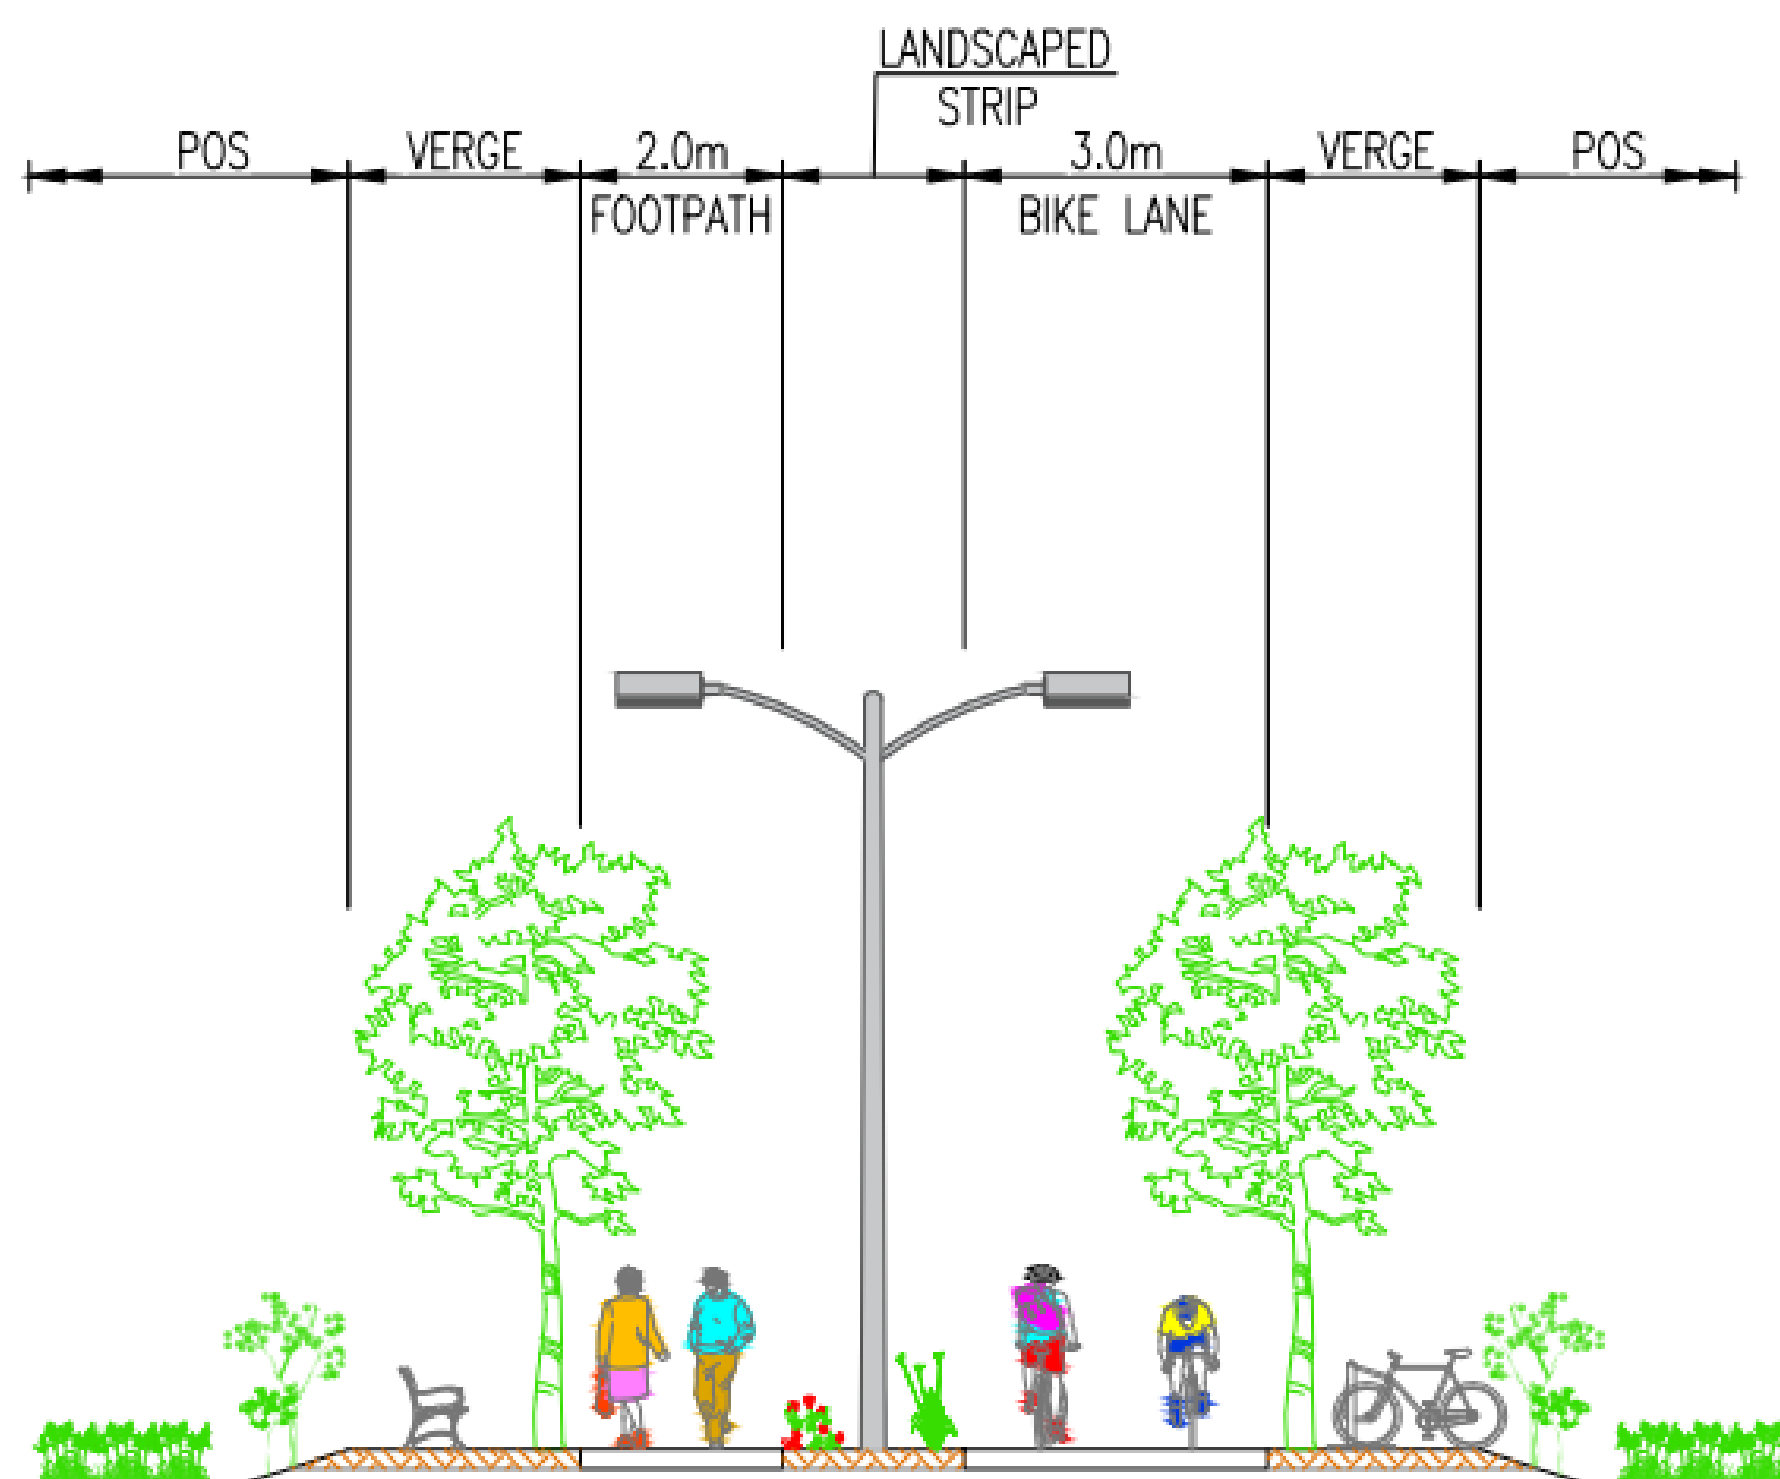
CROSS SECTION LINK ADJOINING POS BOTH SIDES
